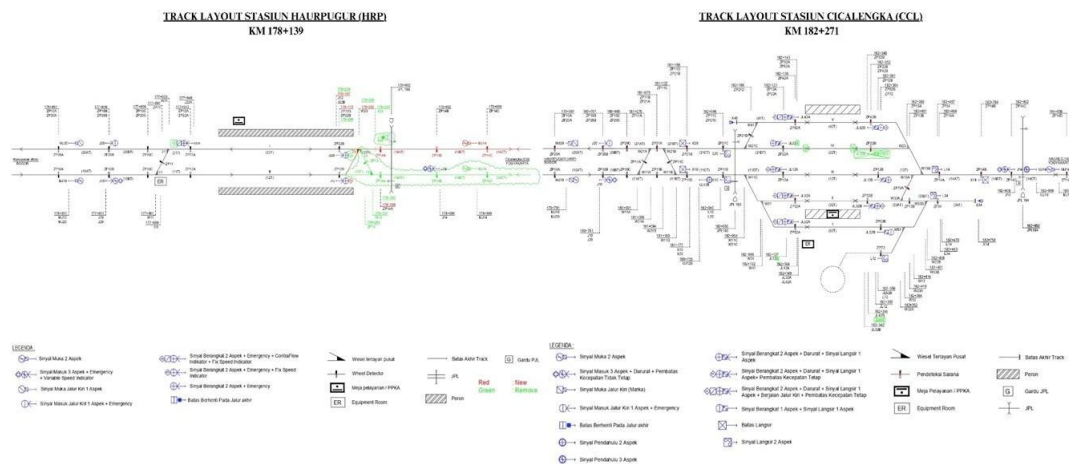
Track Layout Design Plan for Haurpugur Station and Cicalengka Station
